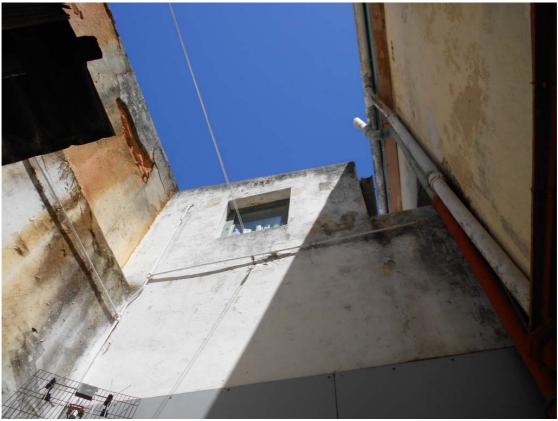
View inside back yard of barber shop. Note new independent wall adjacent stone wall.
